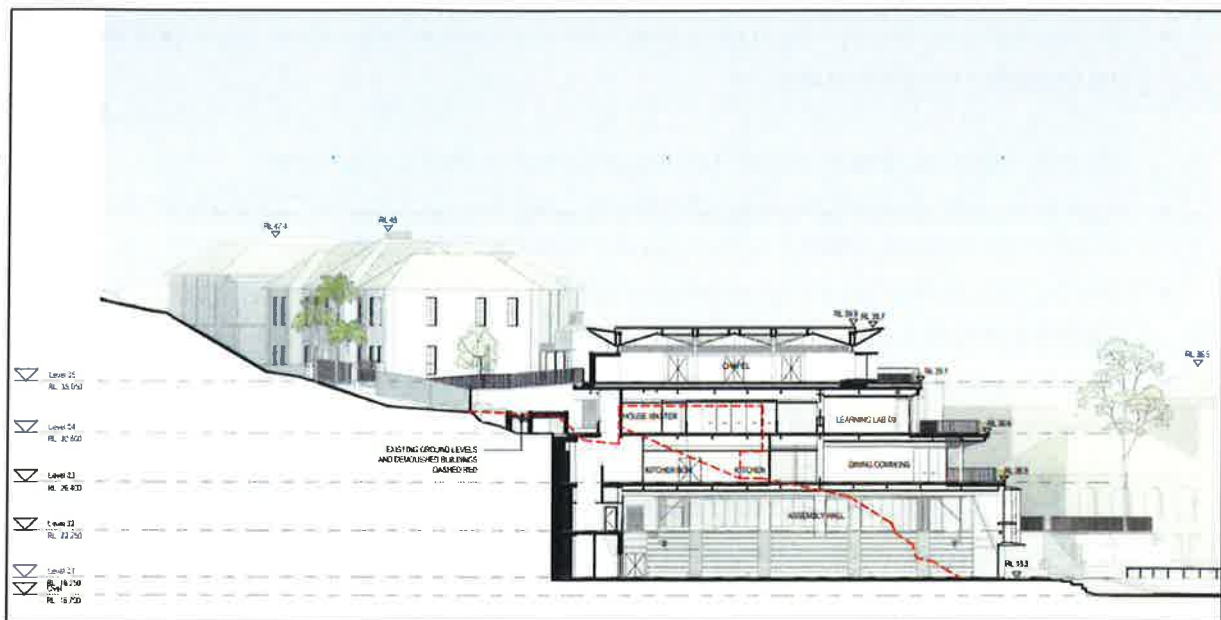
| Cross sectional view of New Centenary Building from Rose Bay Avenue (Source: Applicant's RtS 2019).
